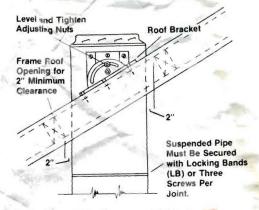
ROOF SUPPORT POSITION ON SCOPED ROOF
